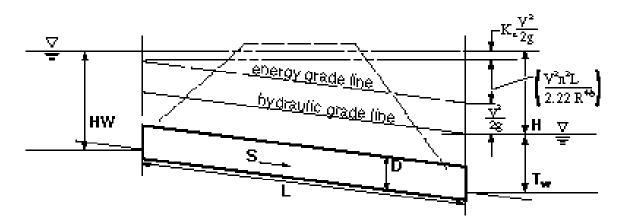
A INLET/OUTLET CONTROL CONDITIONS
